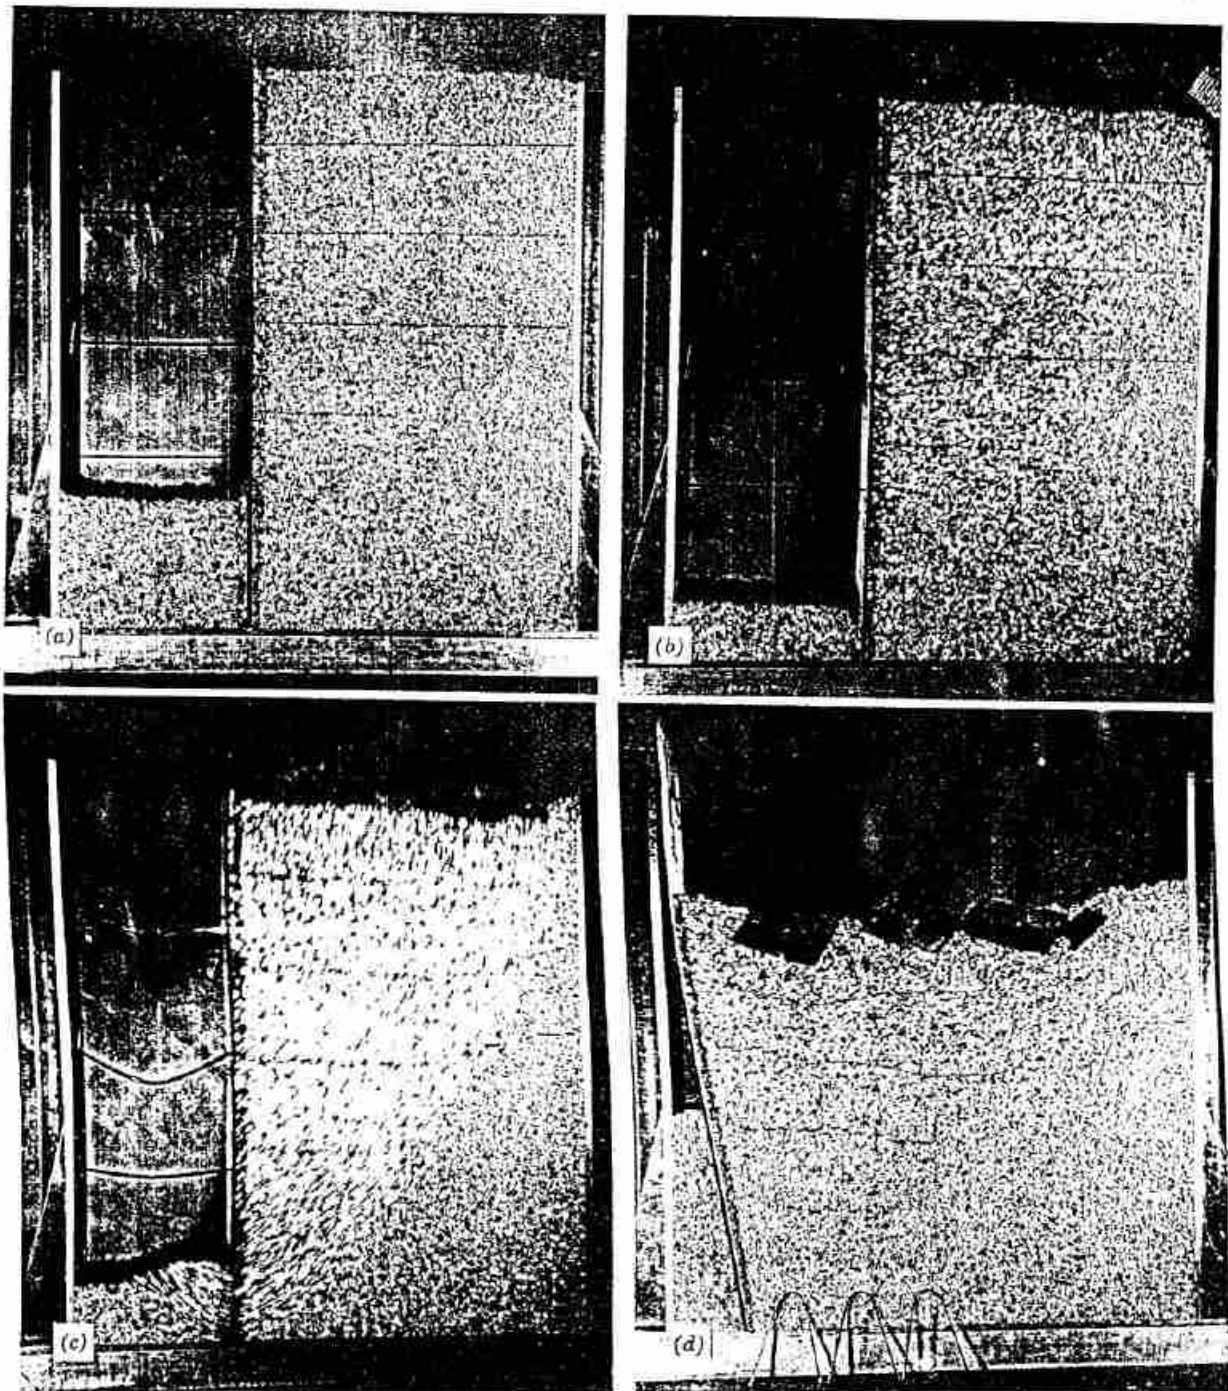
Failure of model of braced excavation. (a) Stable. (b) About to fail. (c) Failing; note motions. (d) After failure.
